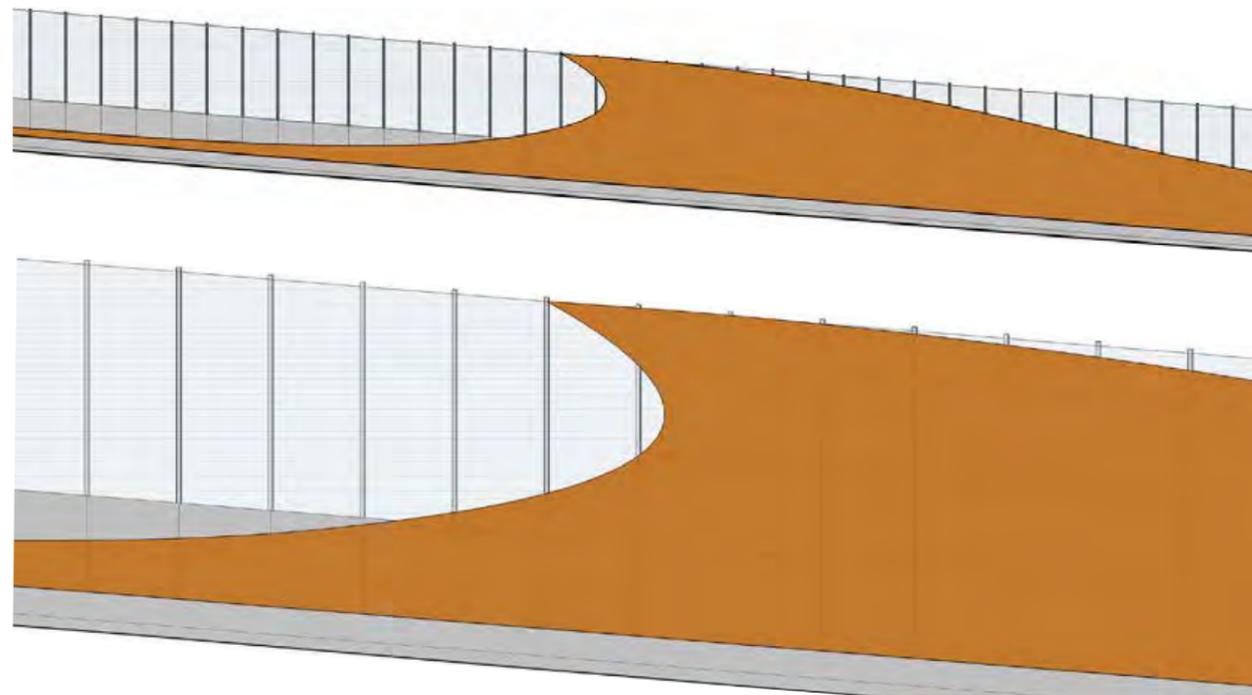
Elevation of highly visible retaining wall facing road corridor - Finish type RW-F1
